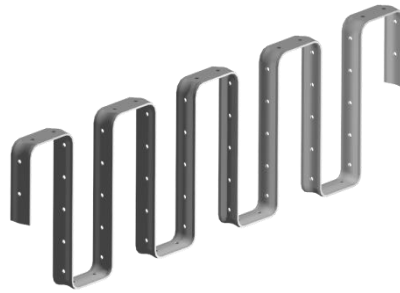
Thin plate stirrups (Lenton Steel Fortress).
